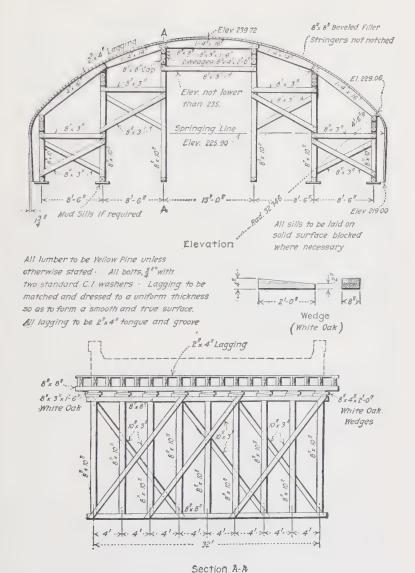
Details of arch centers for Center Street bridge, Phillipsburg, N. J.
